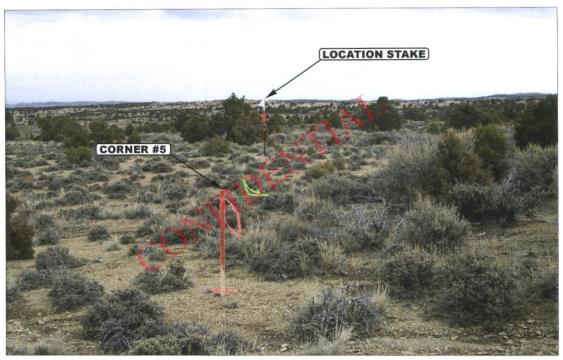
PHOTO: VIEW FROM CORNER #5 TO LOCATION STAKE
